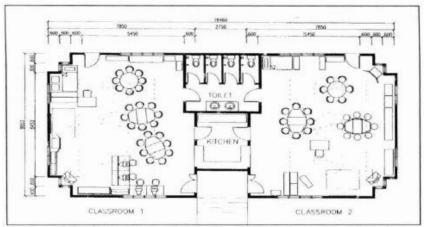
Example of layout floor-plan of new preschool building(annex building) with two classrooms
